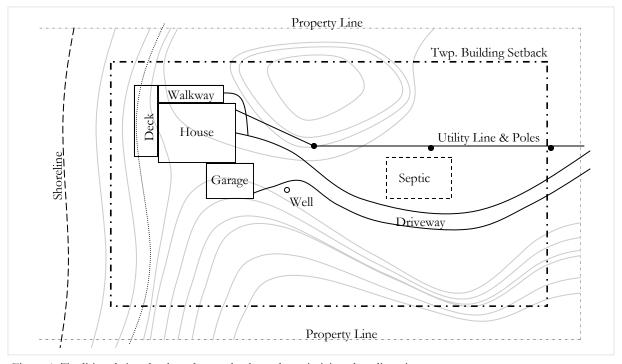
Traditional site plan based on setbacks and maximizing shoreline view.
